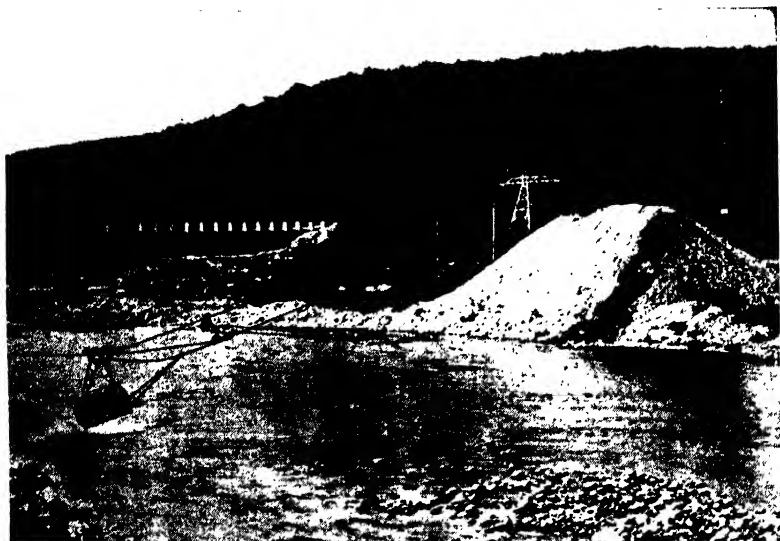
Slackline excavator digging river gravel and storing it on shore.
